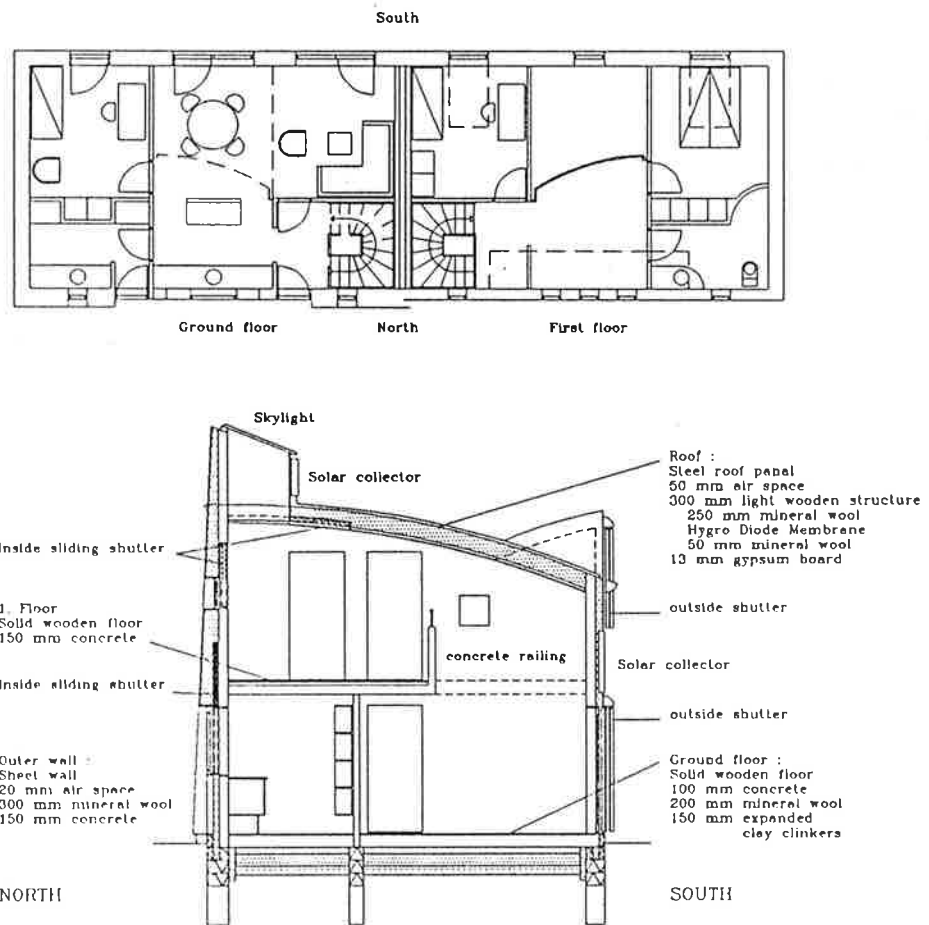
Plans and cross section, rowhouse with north/south-facing facades.
